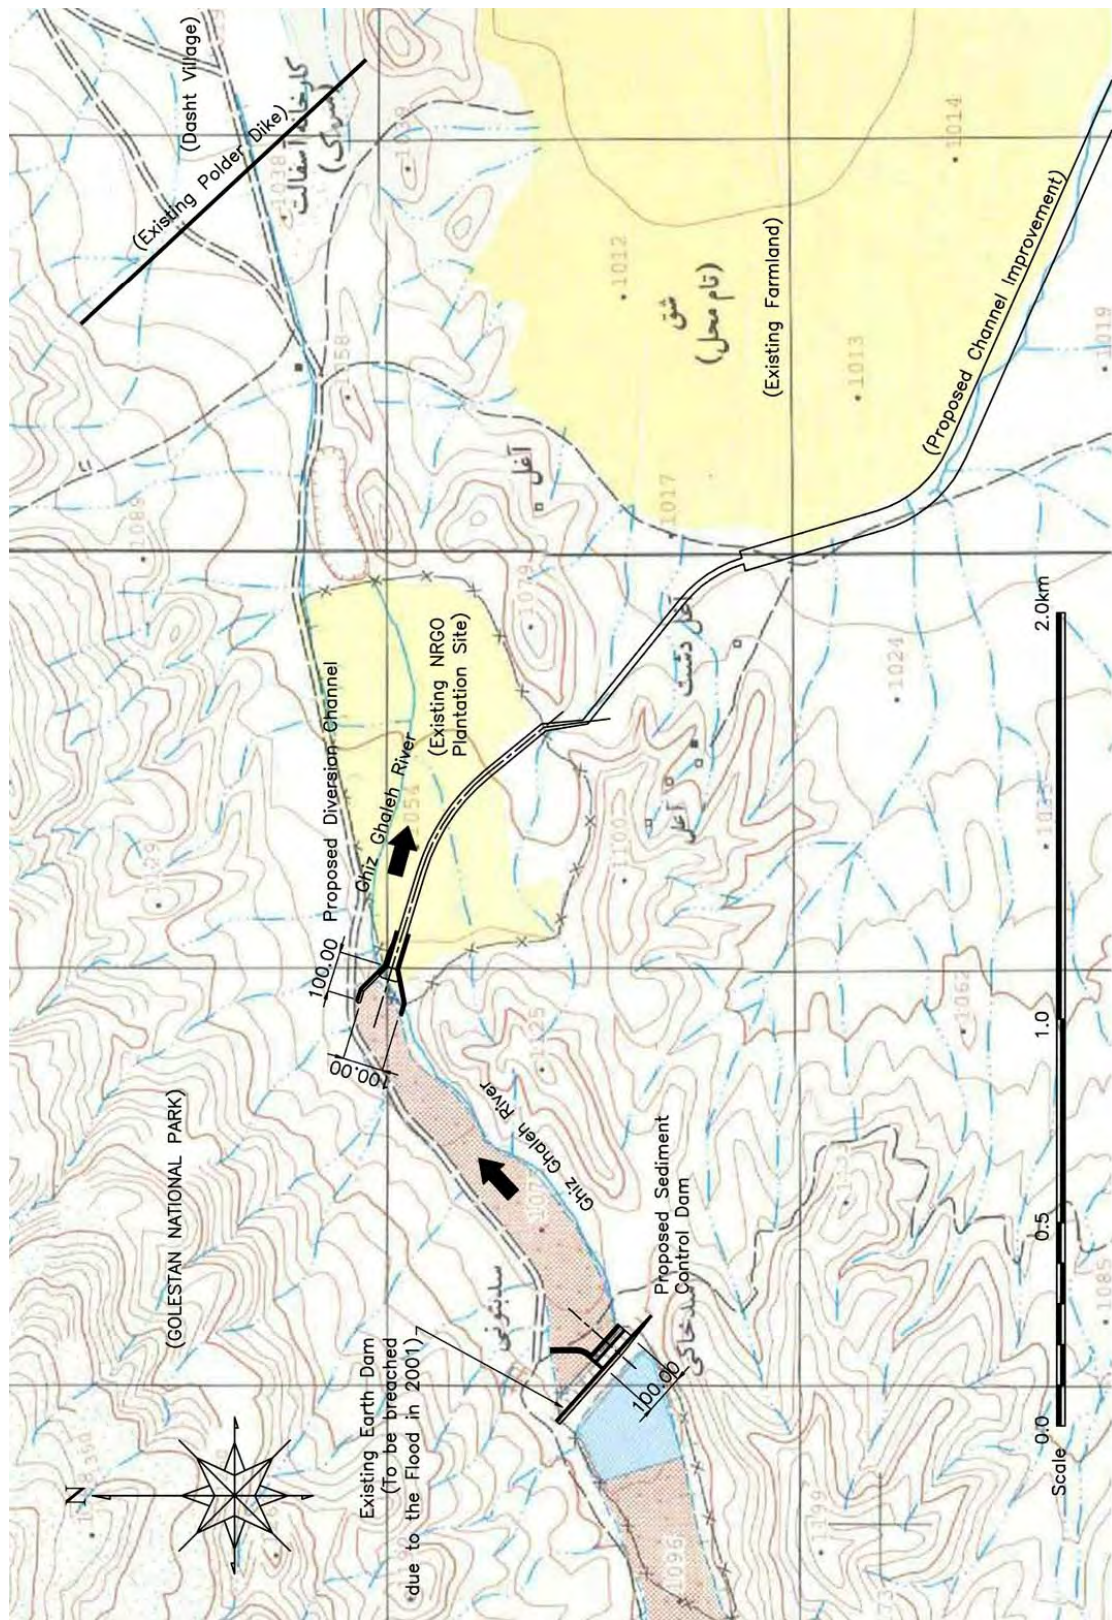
Proposed Arrangement of Sediment Control Dam Facilities
